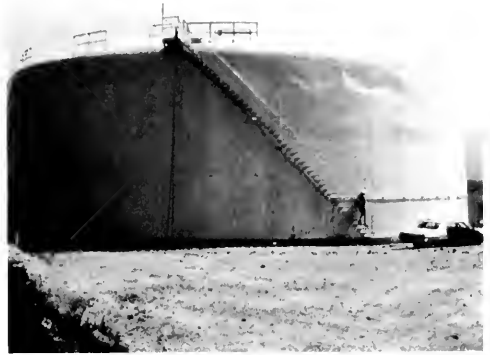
Joseph Jensen Filtration Plant, wash water tank. Note wrinkle in shell in top course.
